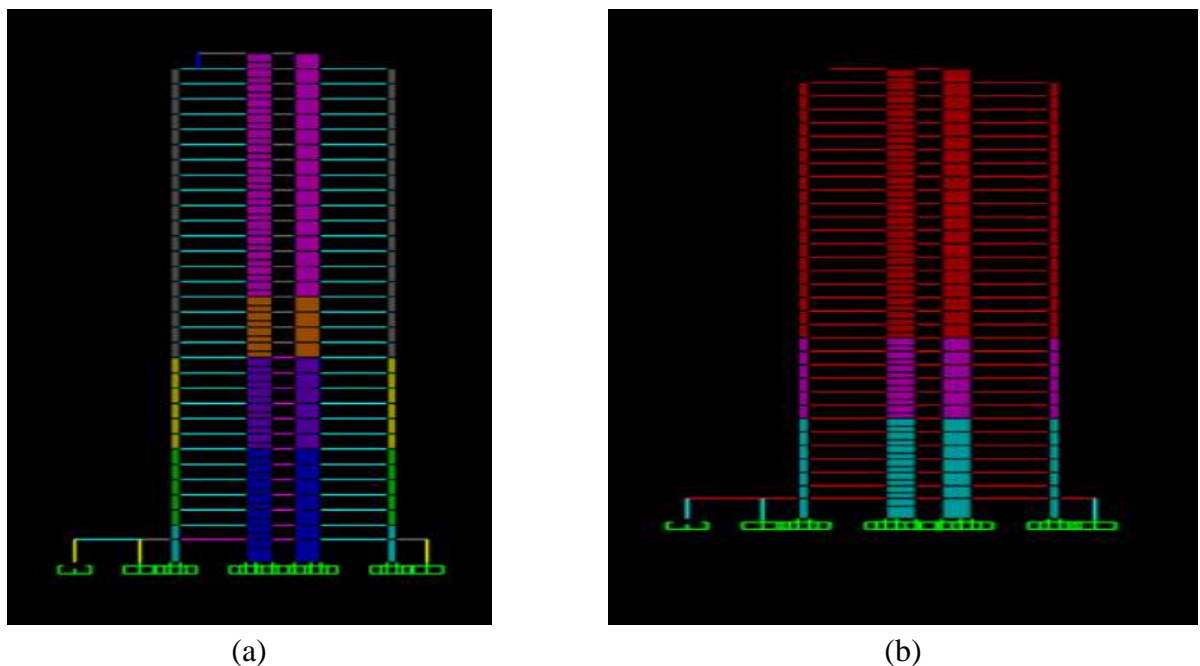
Elevation of the building (a) Dual System; (b) Shear Wall System
